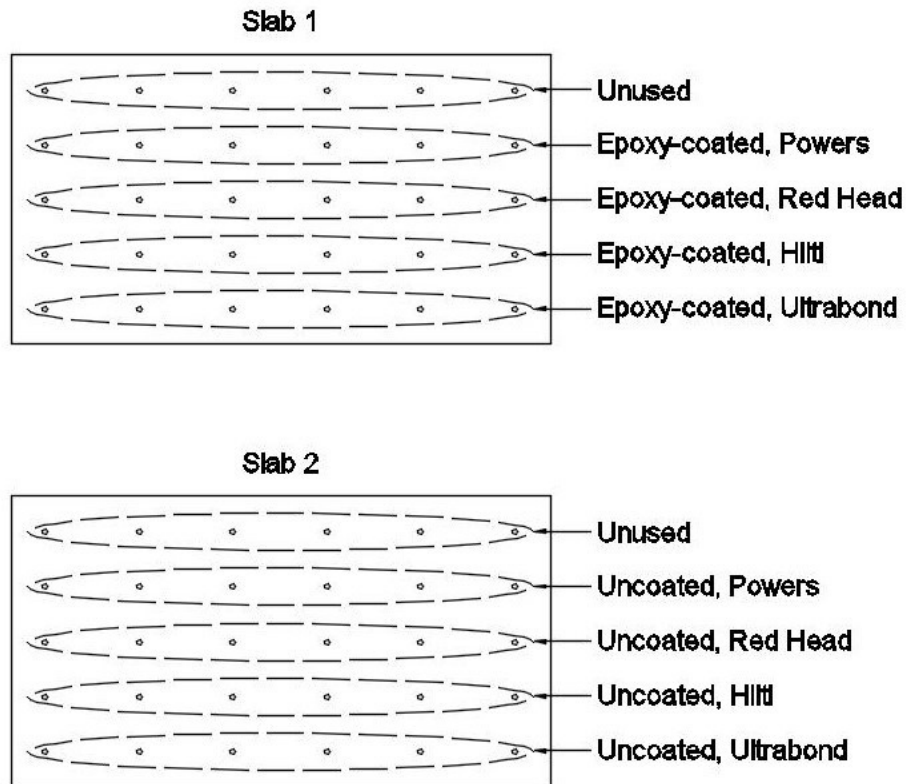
Location of epoxy-coated or uncoated reinforcing bars and the type of chemical adhesive used to install each row of bars in the two slabs
